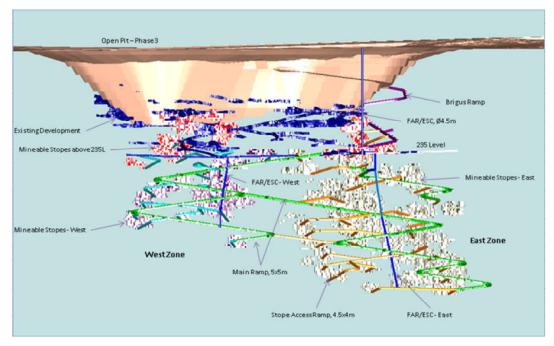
Overall Mine Section Showing Open Pit & Underground
